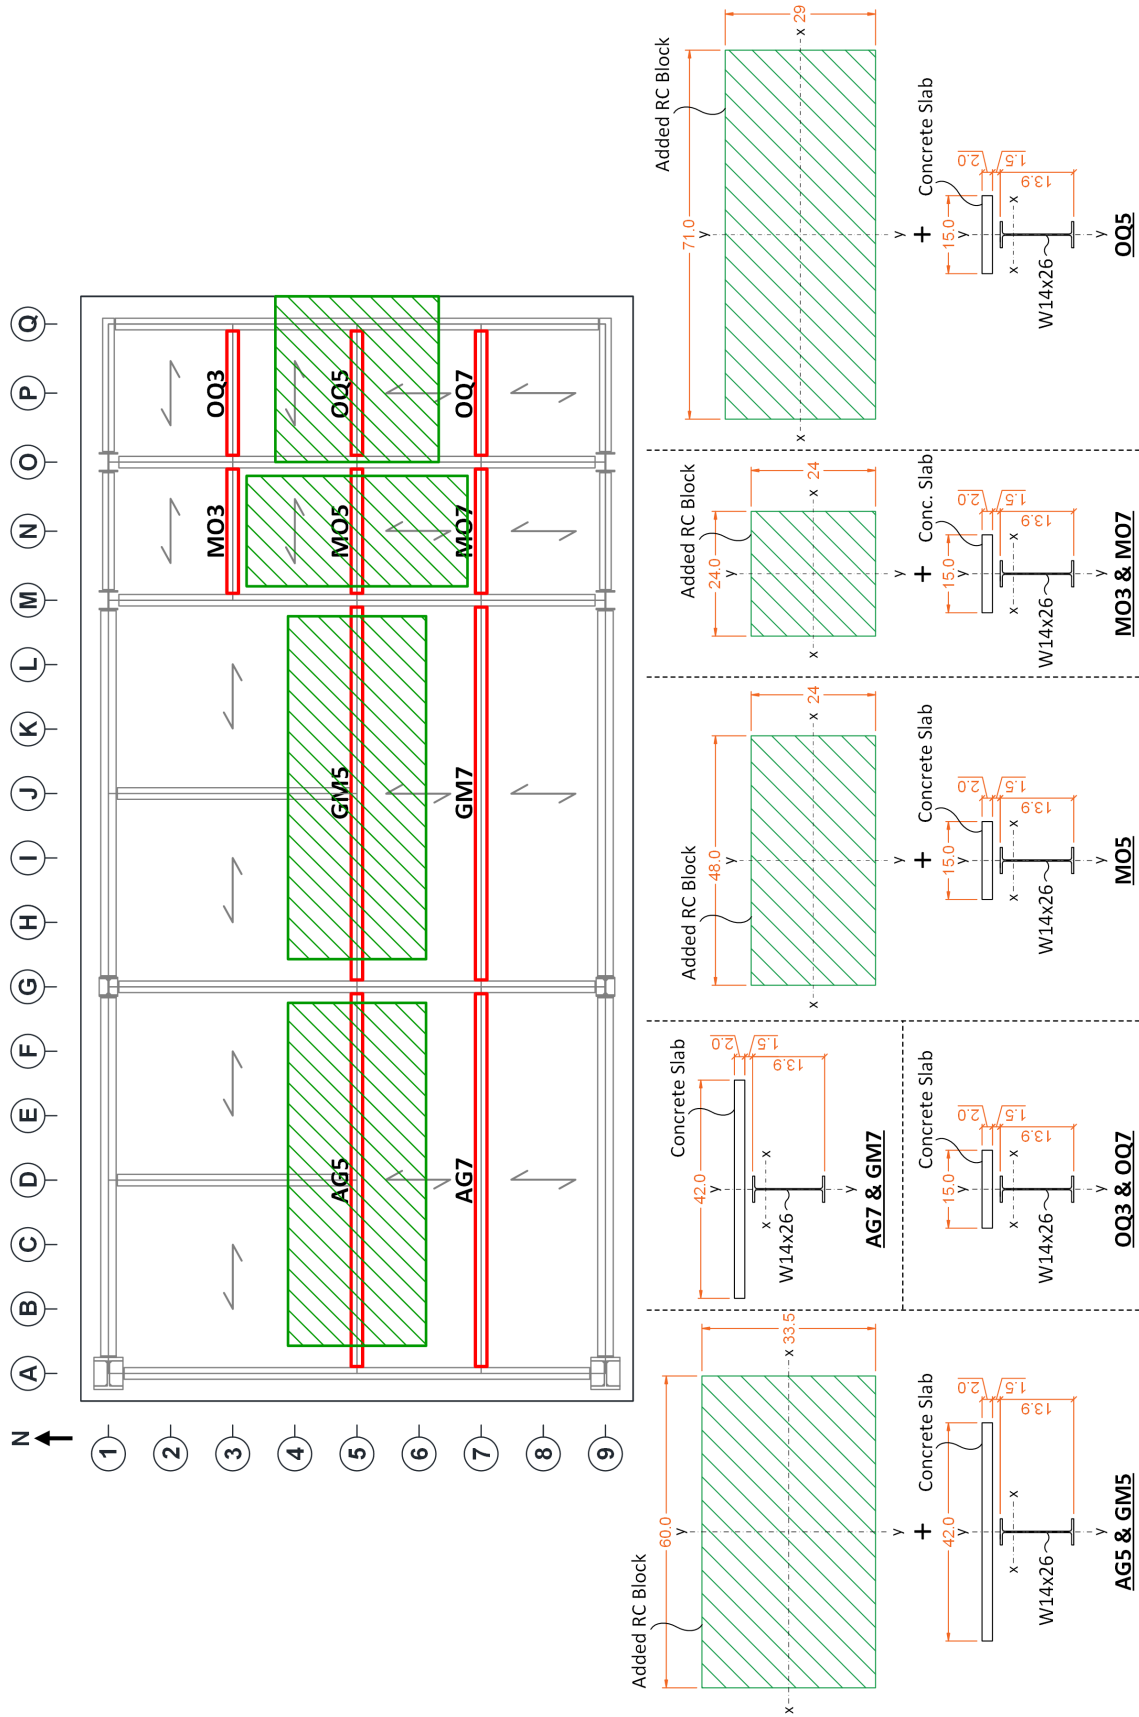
Composite Sections for Longitudinal Beam Modeling (with Cross Sections of Added RC Block)
